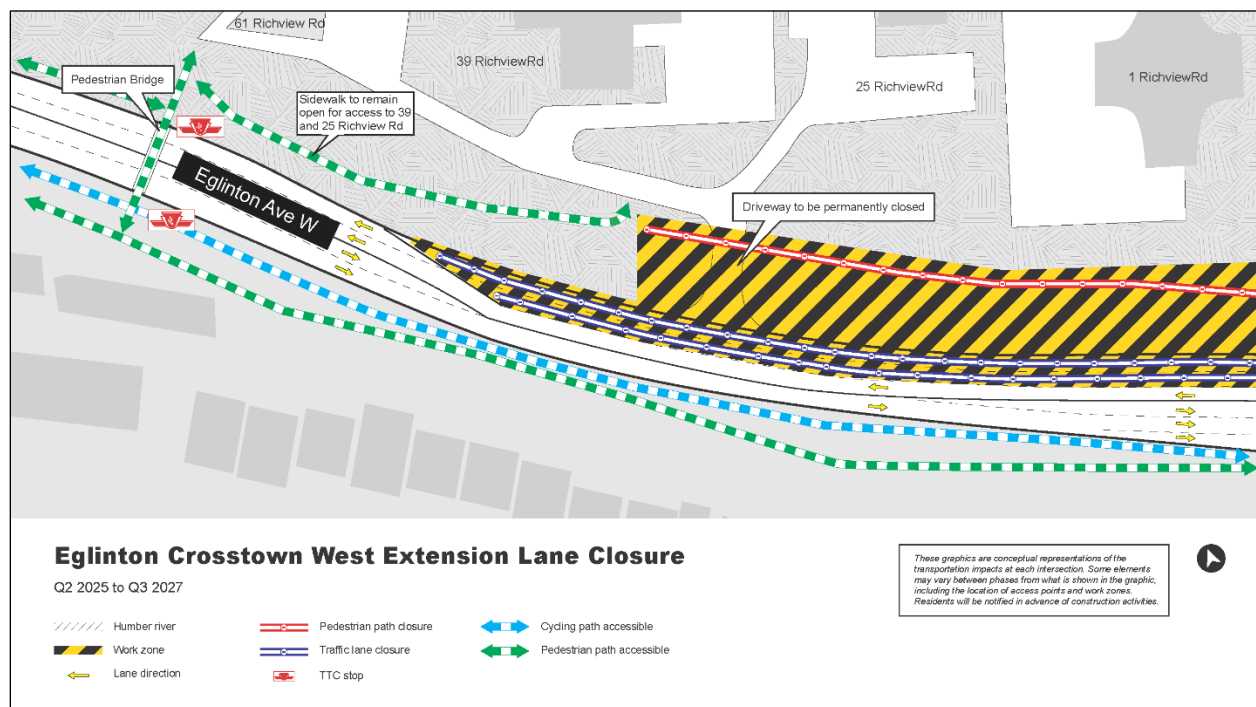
ECWE Extraction Shaft and Scarlett Tunnel Portal Work Site
